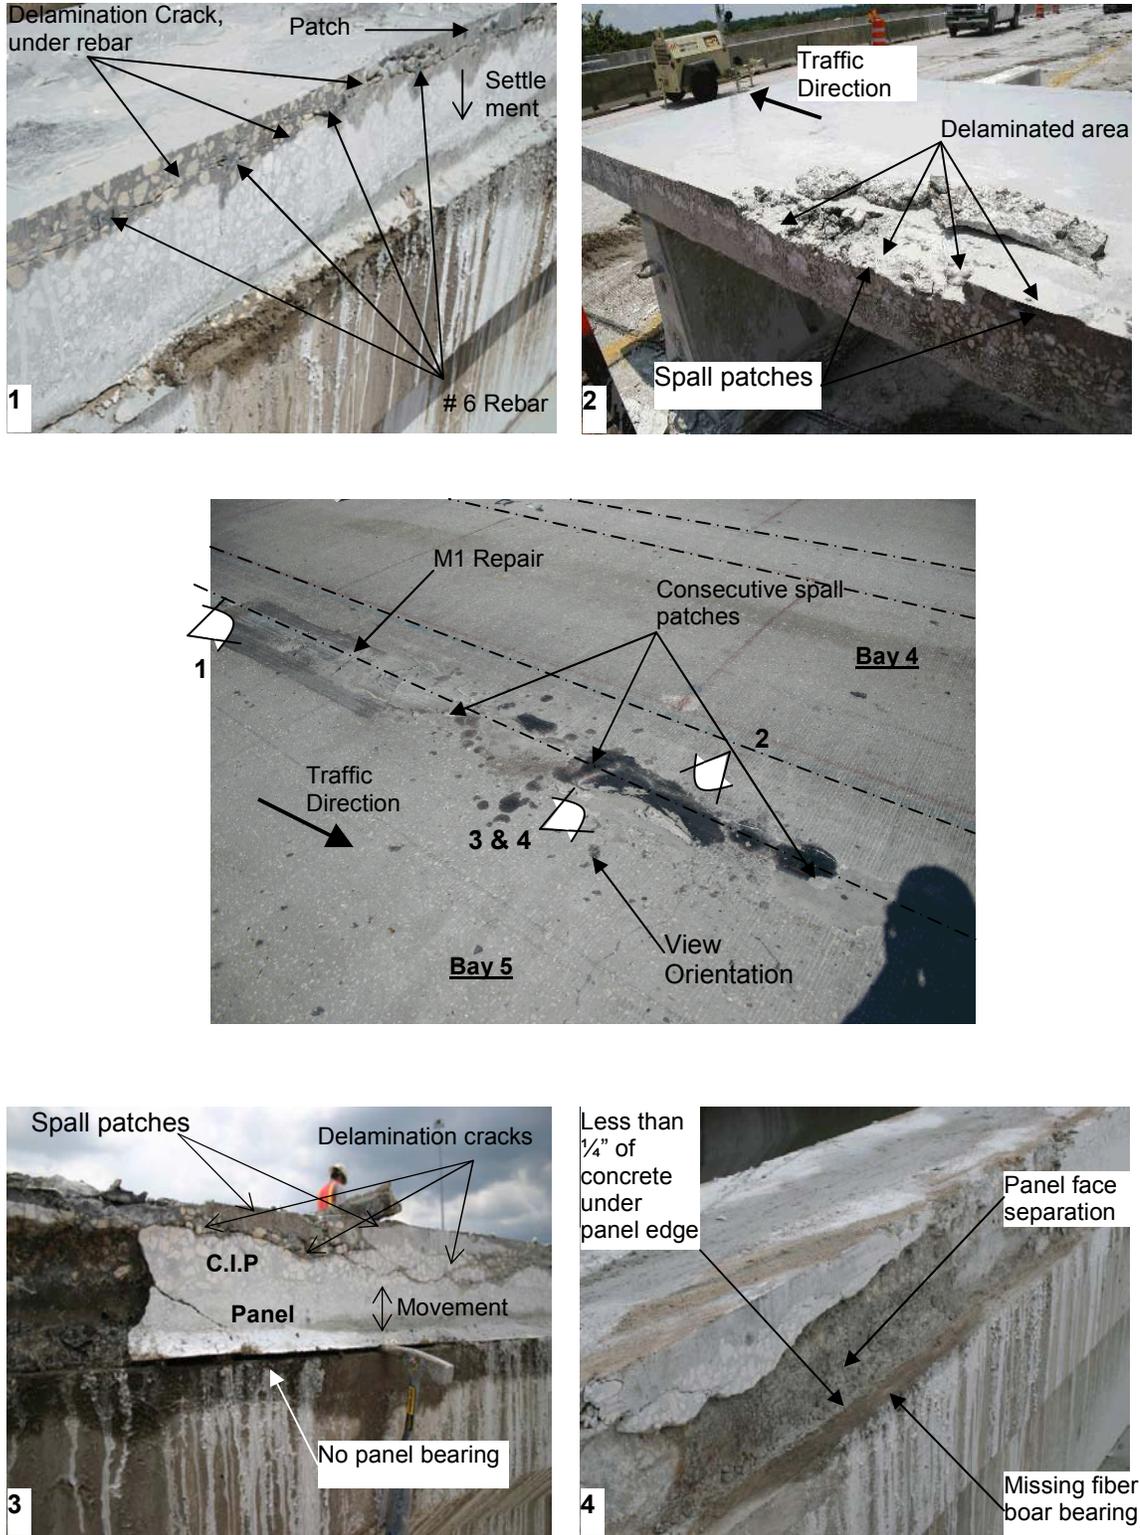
Examination of a Deteriorated Deck Section on Bridge #100415
